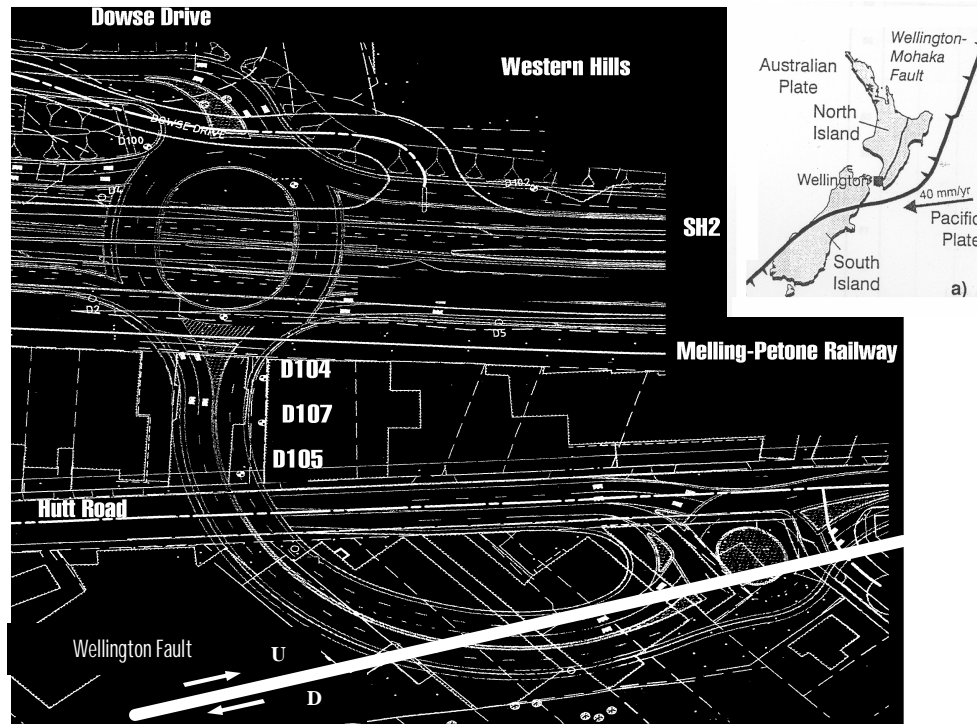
Location Plan for SH2 Dowse Interchange and connecting overbridge to Hutt Road. (1a) Inset: Tectonic plate boundary in relation to Wellington.
